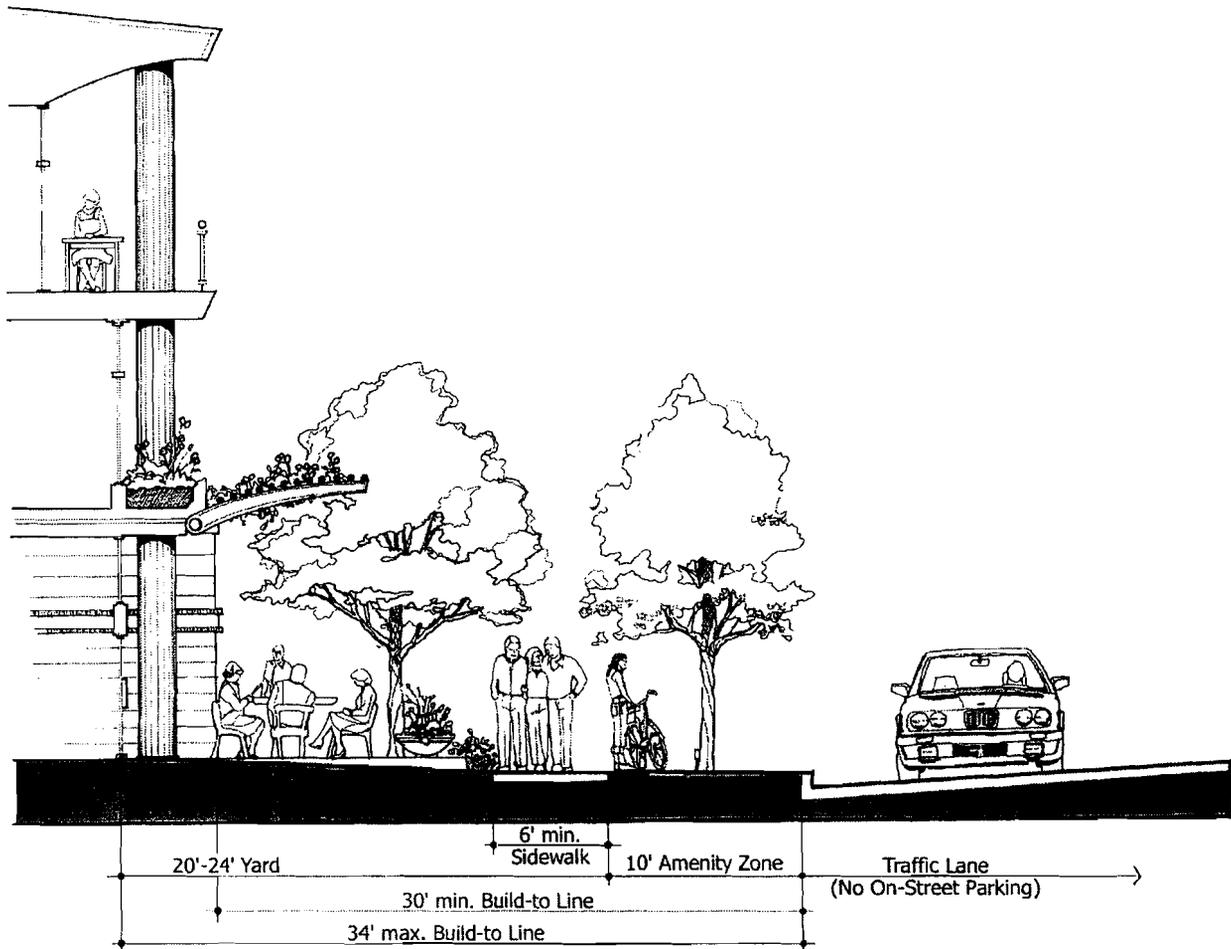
Street section, arterial streets and Greenville Avenue
